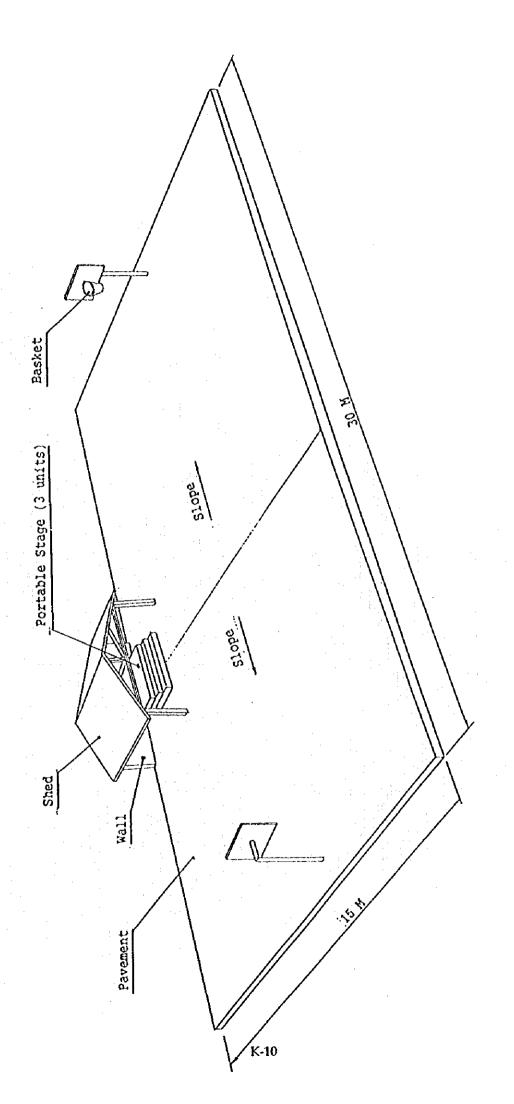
GENERAL PLAN OF MULTI-PURPOSE DRYER
